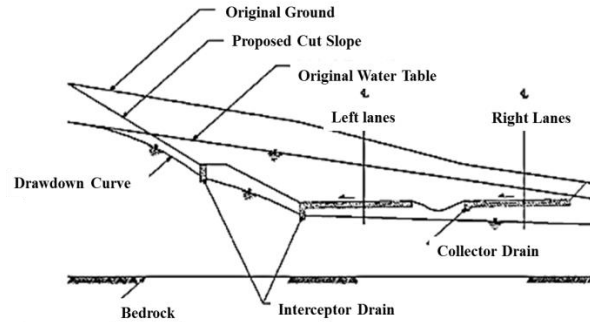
(b): Multiple, multipurpose longitudinal water drain installation.
